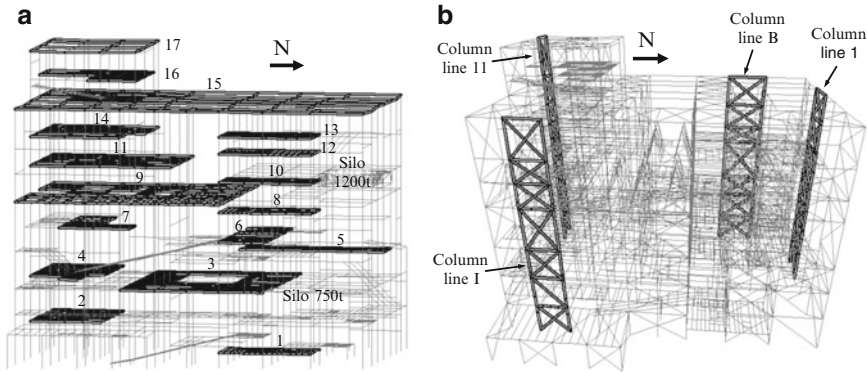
Analytical model in STAAD.Pro: (a) location of platforms, (b) elevation of the braced frames studied
